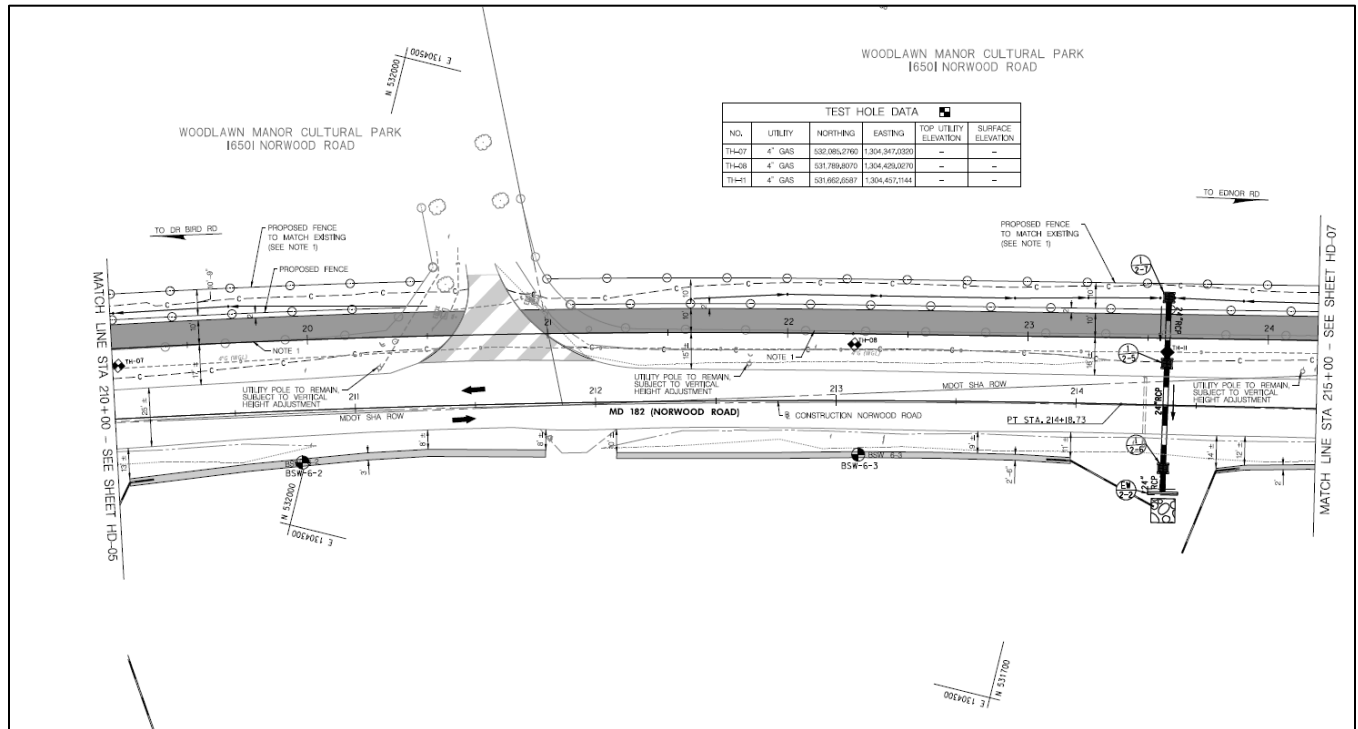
Plan view of the proposed Sidepath at the Entrance of Woodlawn Manor Cultural Park
